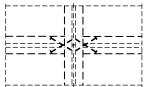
Details of support condition "screw-fixed" of JJI floor
